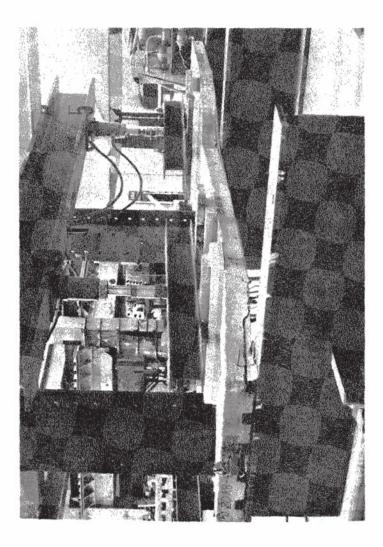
Dual span Slab 20R8-4.5 at failure.
